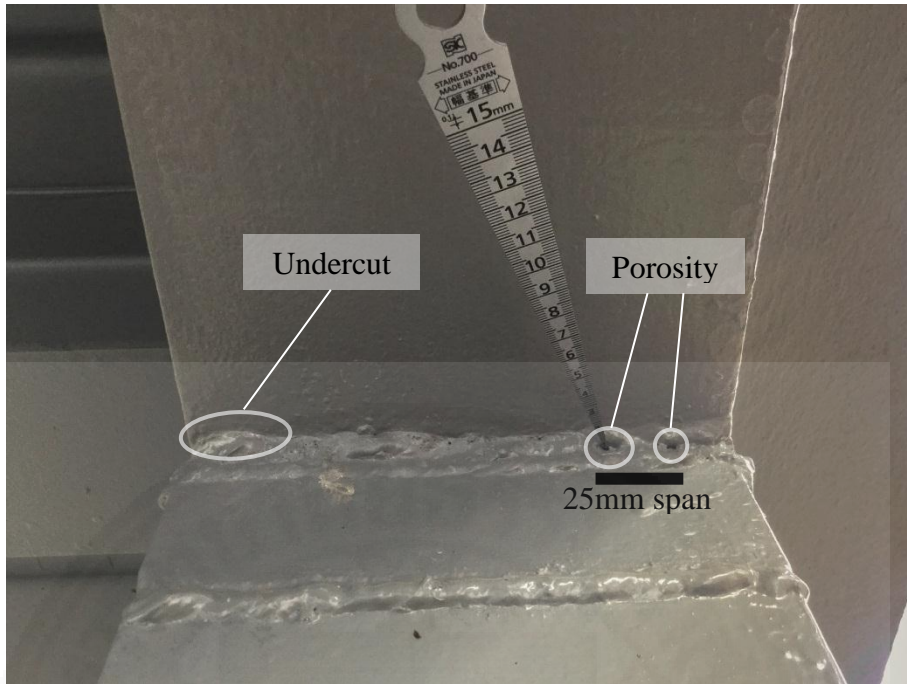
Welding defects on Steel Structure A (joint 7)
